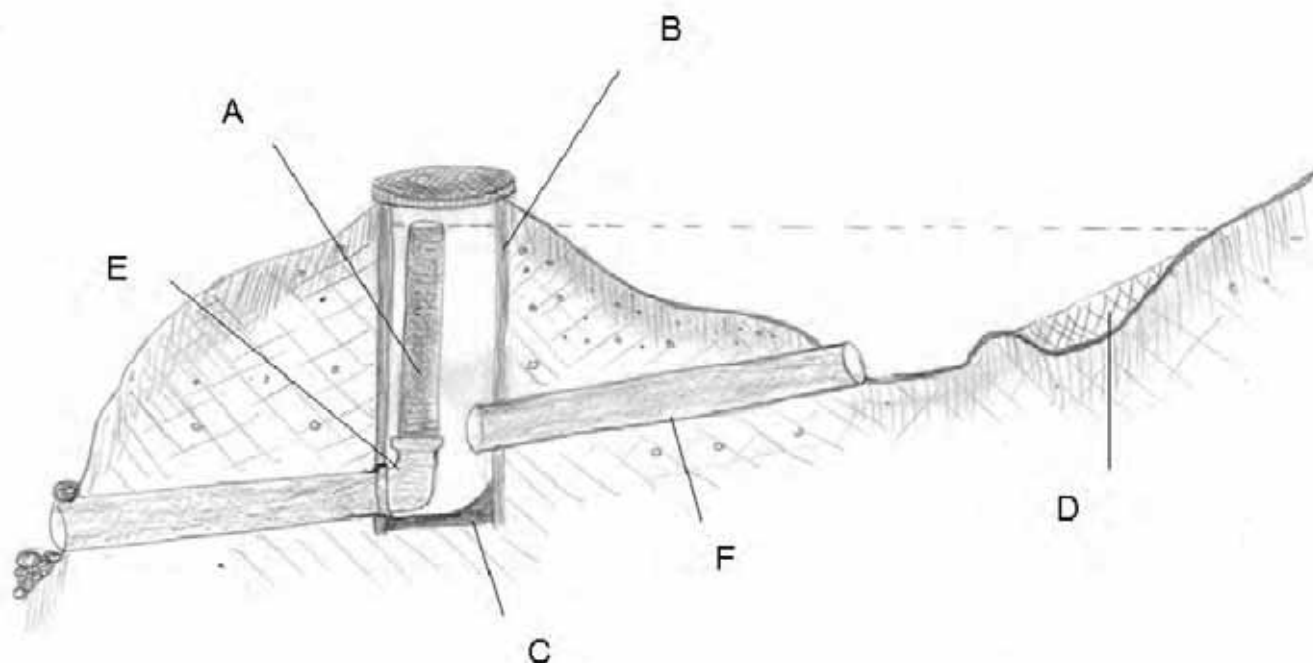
Pond barrage. A: removable pipe KG DN 300 (diam. 30 cm), B: concrete hopper with concrete lid (diam. 100 cm), C: concrete waterproof bottom to facilitate complete drying up, D: depression in pond bottom filled with clay to prevent remaining water, E: removable bent pipe KG DN 300 (diam. 30 cm), F: KG DN 300 (diam. 30 cm).
